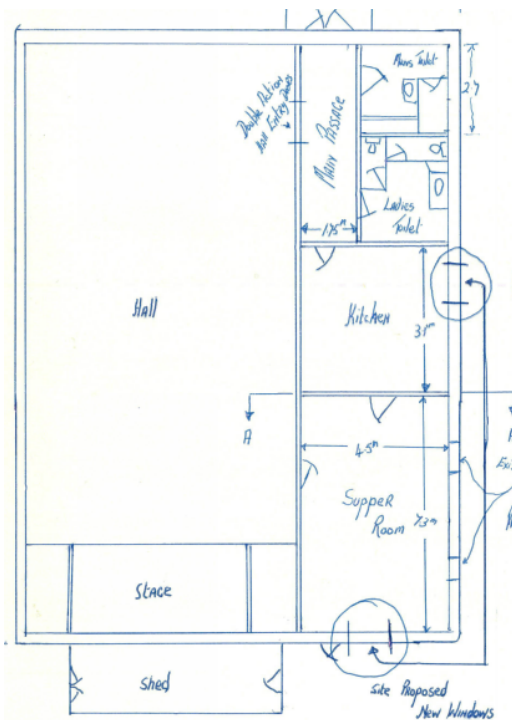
Basic Outline Plan of the Luggate Memorial Hall
